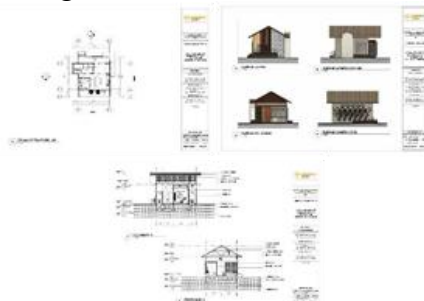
Floor Plan, View, and Section of Cottage Deluxe
